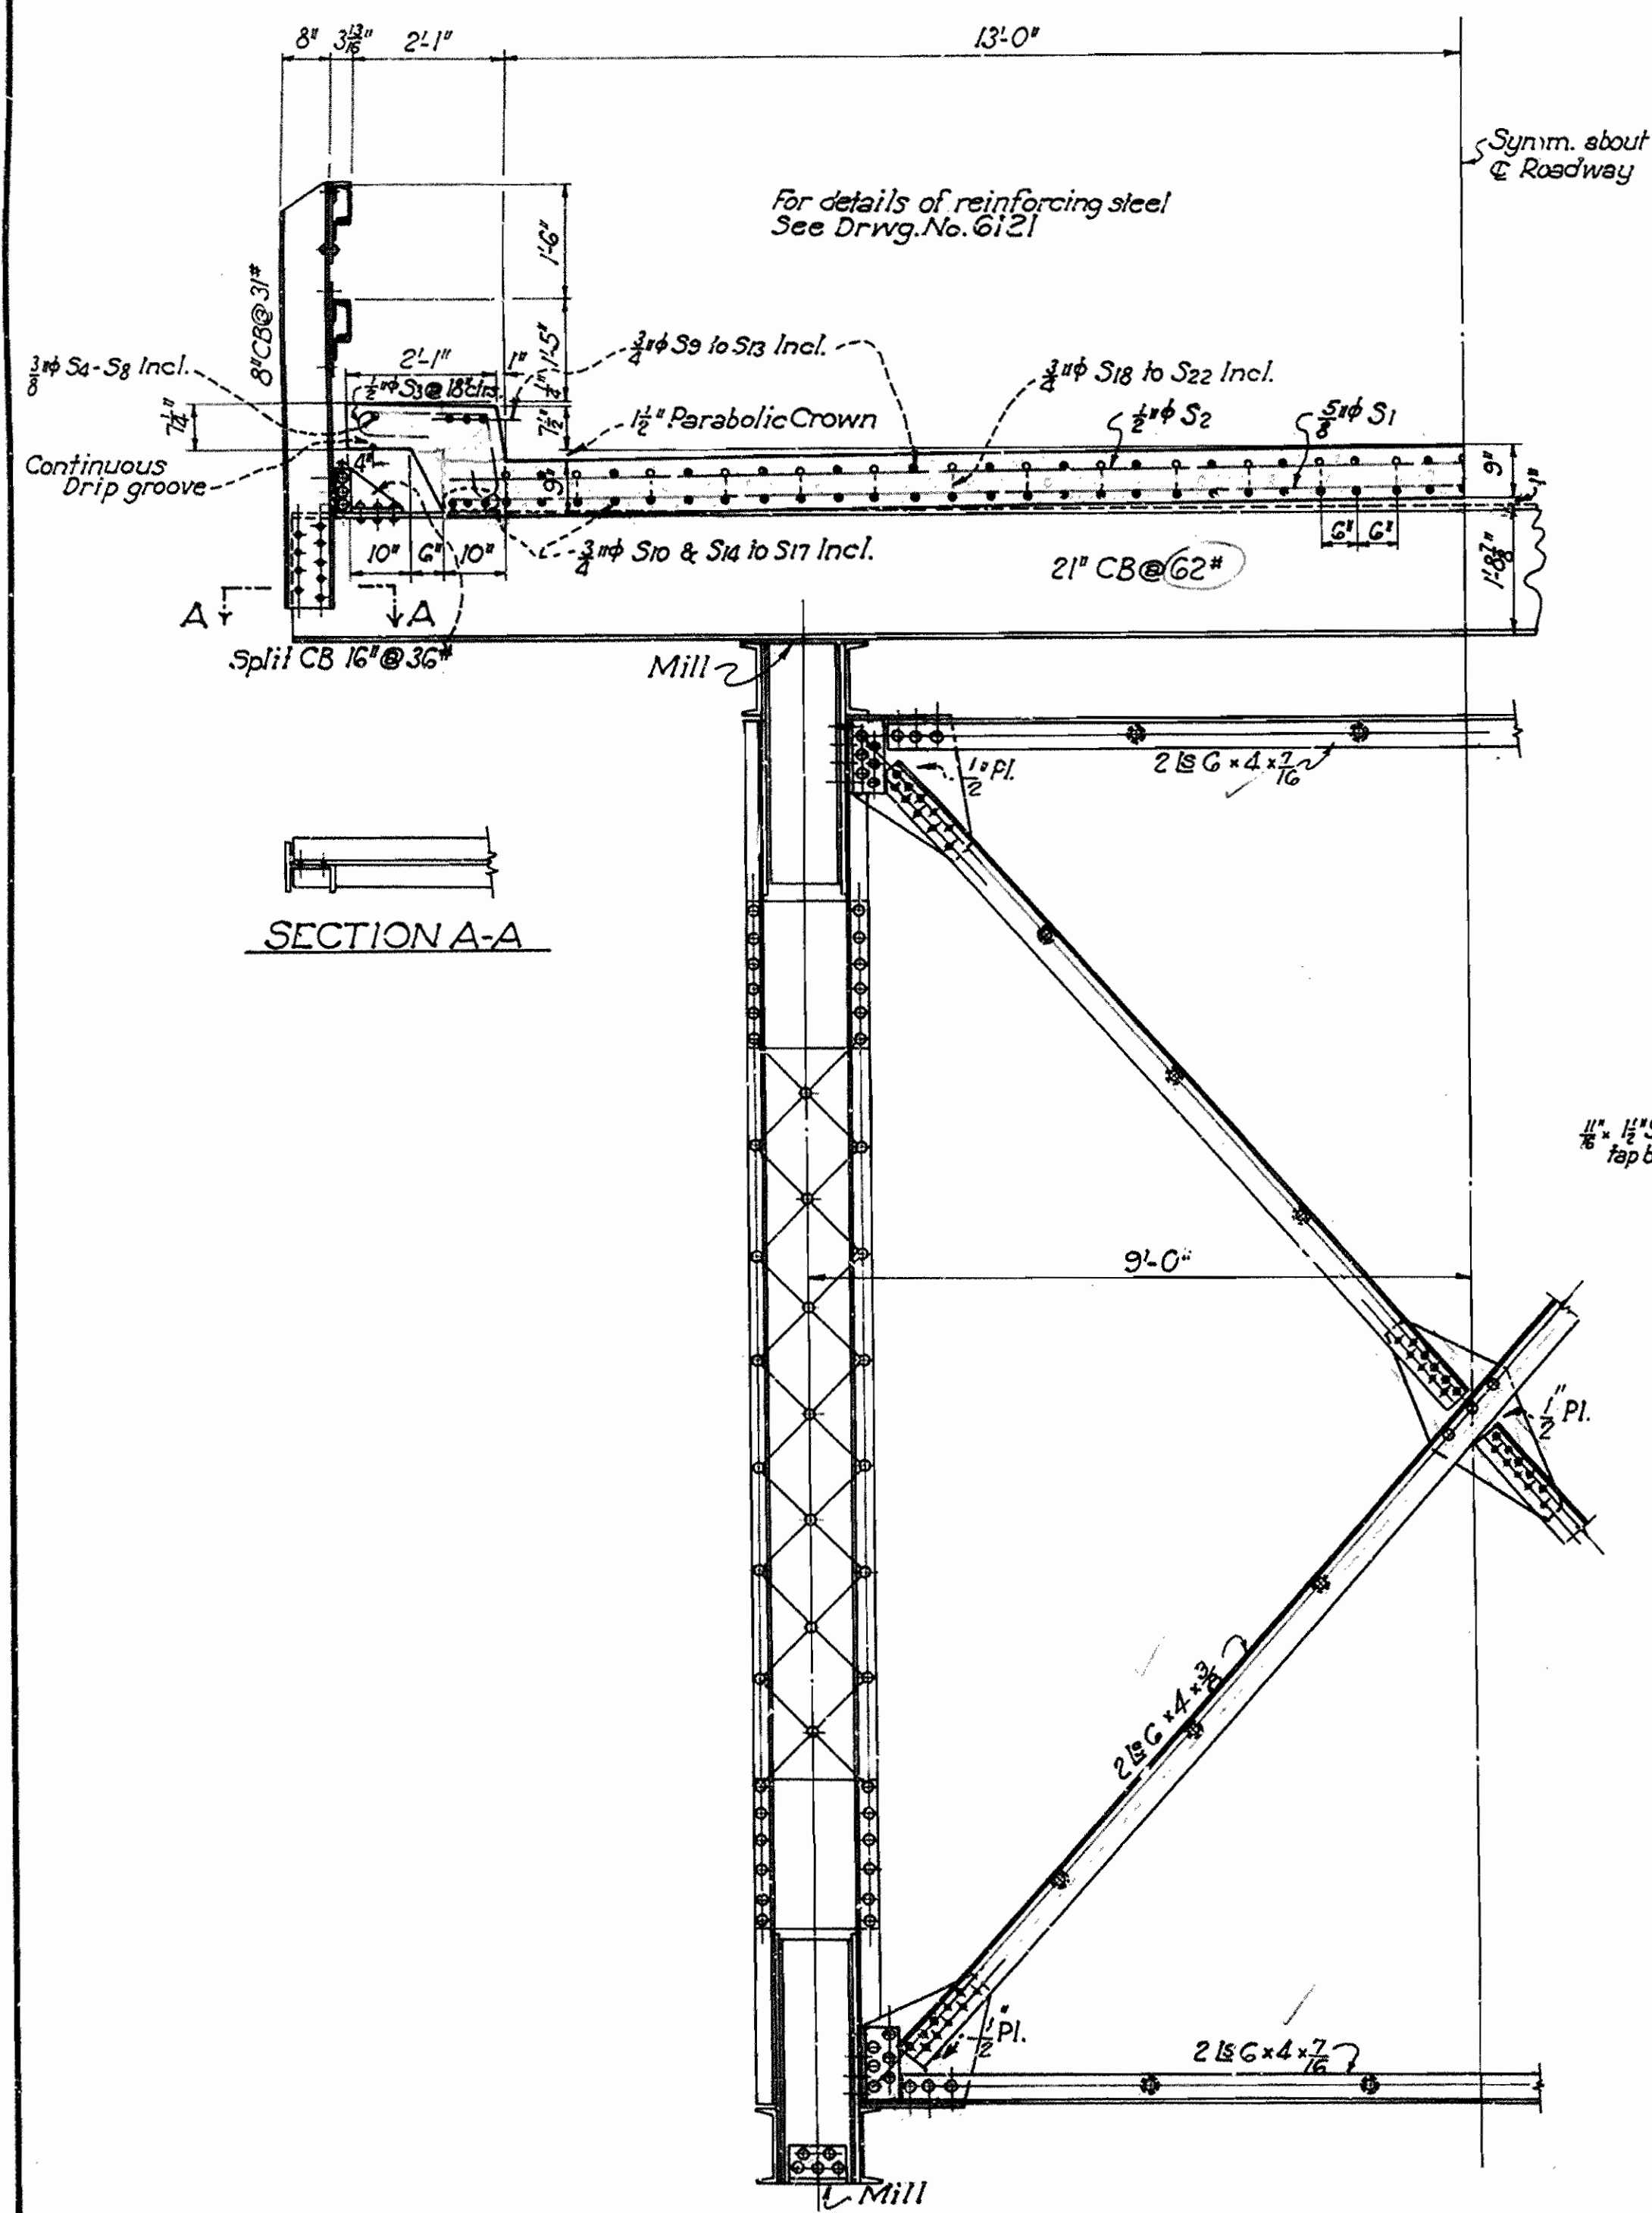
DETAILS OF CROSS FRAMES & REINFORCING STEEL
